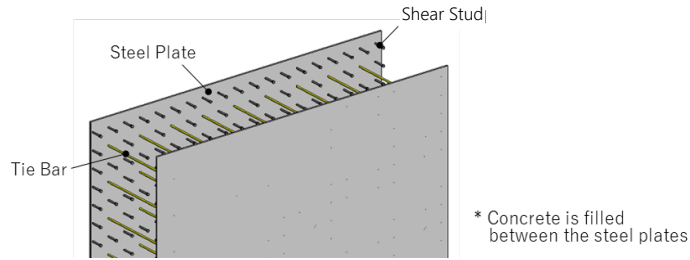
Arrangement of steel plates, tie bars, and shear studs for SC panel
